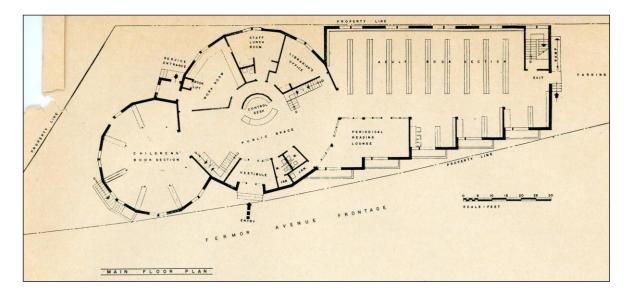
St. Vital Library, 6 Fermor Avenue, "Main Floor Plan," 1963. (<u>Reproduced from</u> <u>Western Construction and Building, June 1963, p. 9</u>.)
